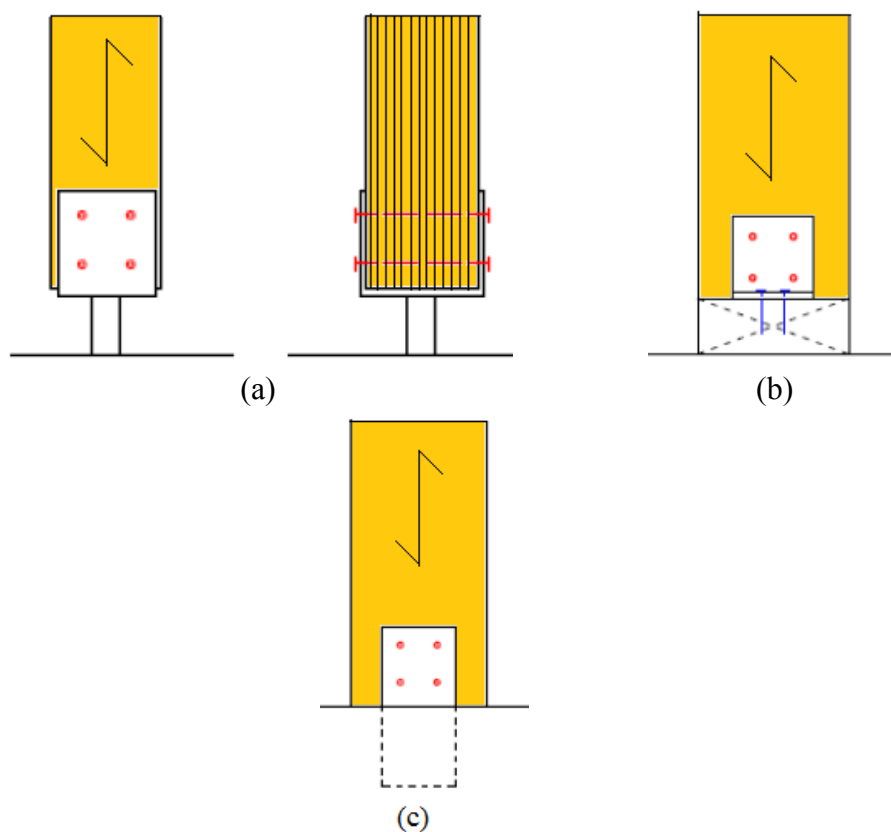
Column-to-base hinged shear connections with: (a) saddle bracket / column foot, (b) angle brackets, and (c) external metal plates (Source: Kovanen, H. 2014)
